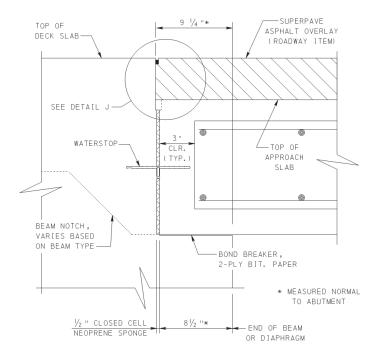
Waterproofing at expansion end (with approach slab in figure)
